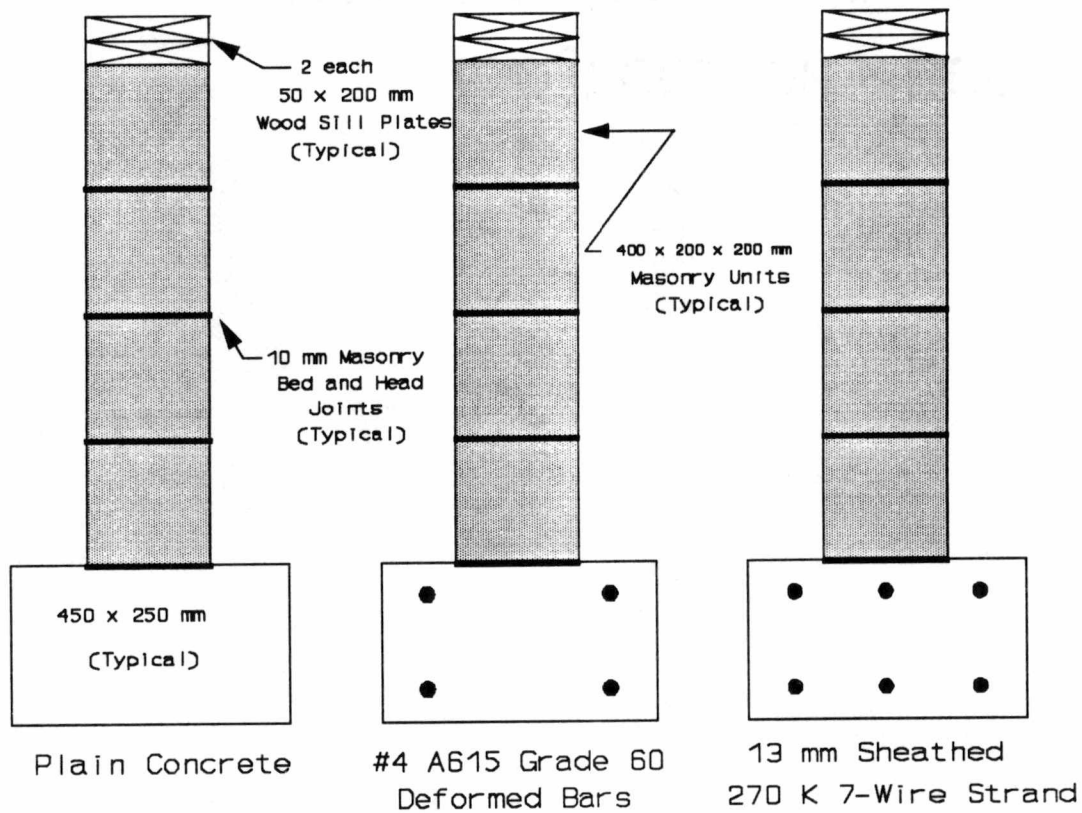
Plain Concrete, Deformed Bar, and Post-Tensioned Footings
